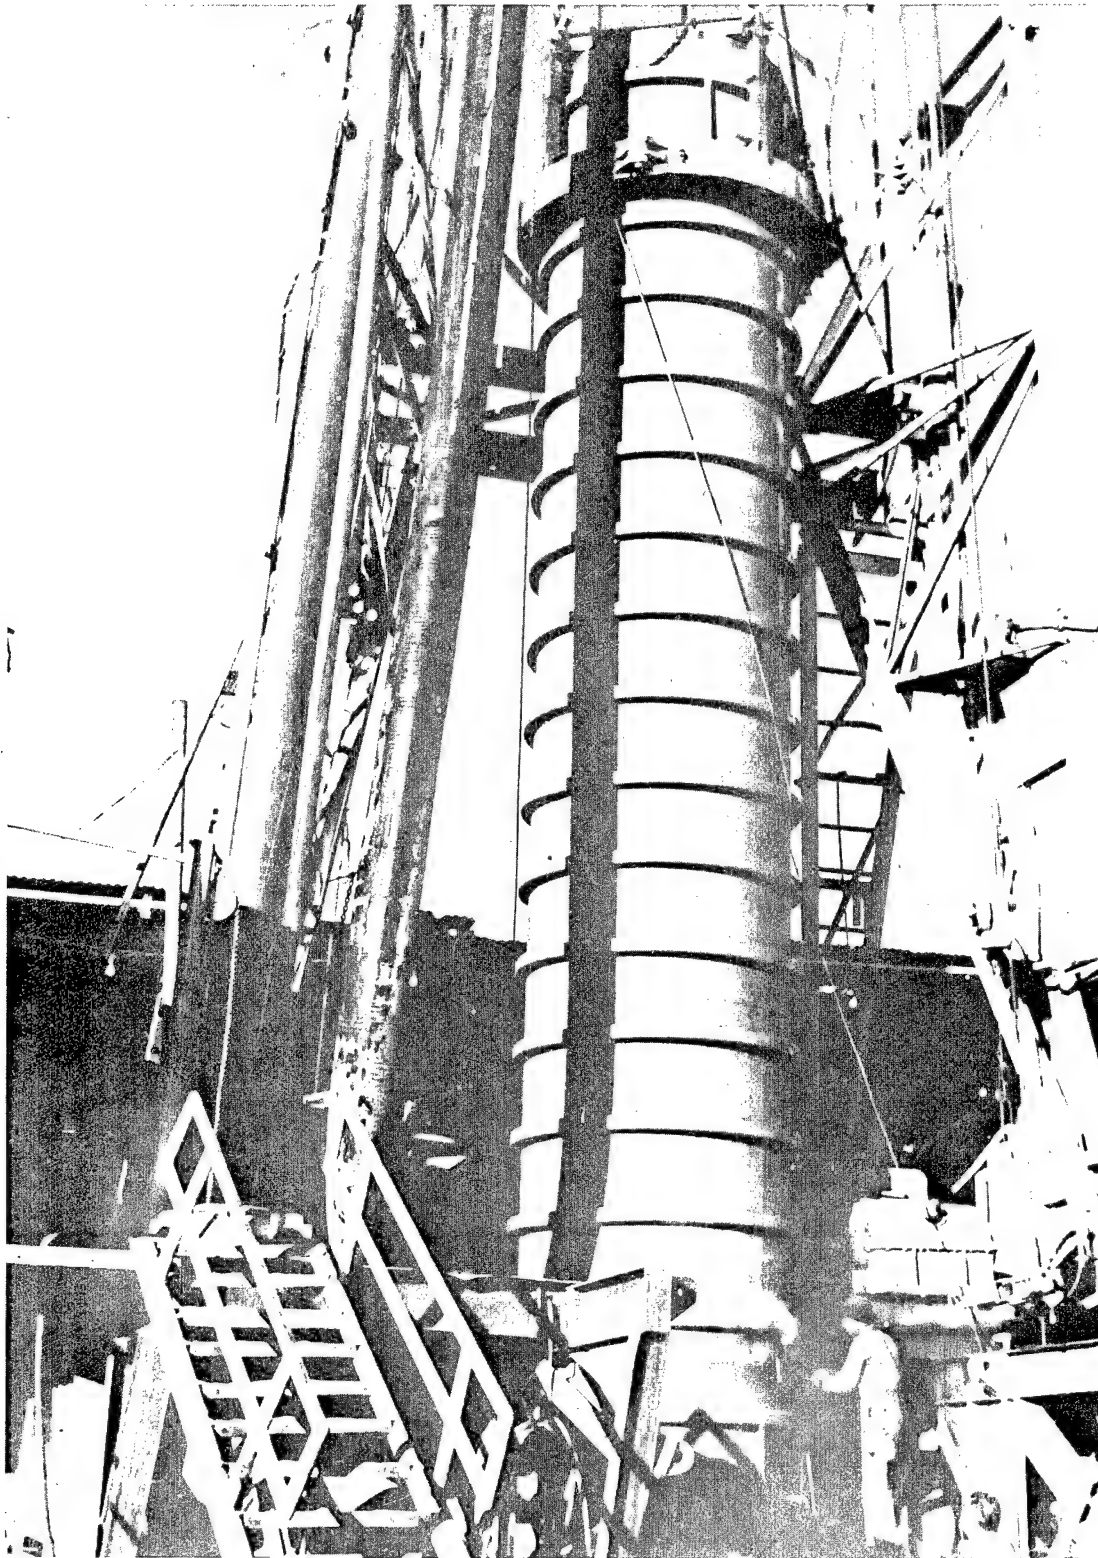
View of rib reinforced large diameter casing being run into a drill hole with the drill rig hoisting equipment. Photo-Drilling Magazine.
